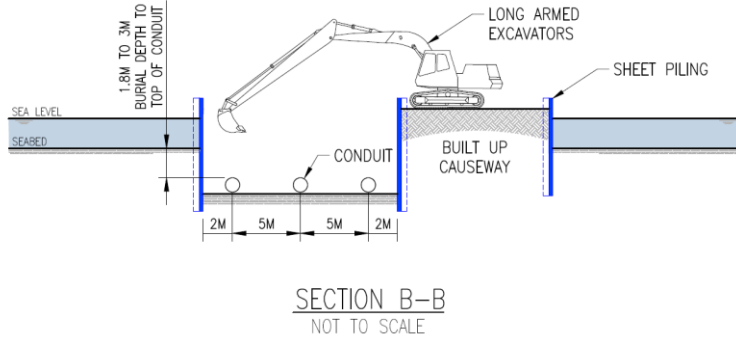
Temporary Works – Cofferdam and Causeway Construction
